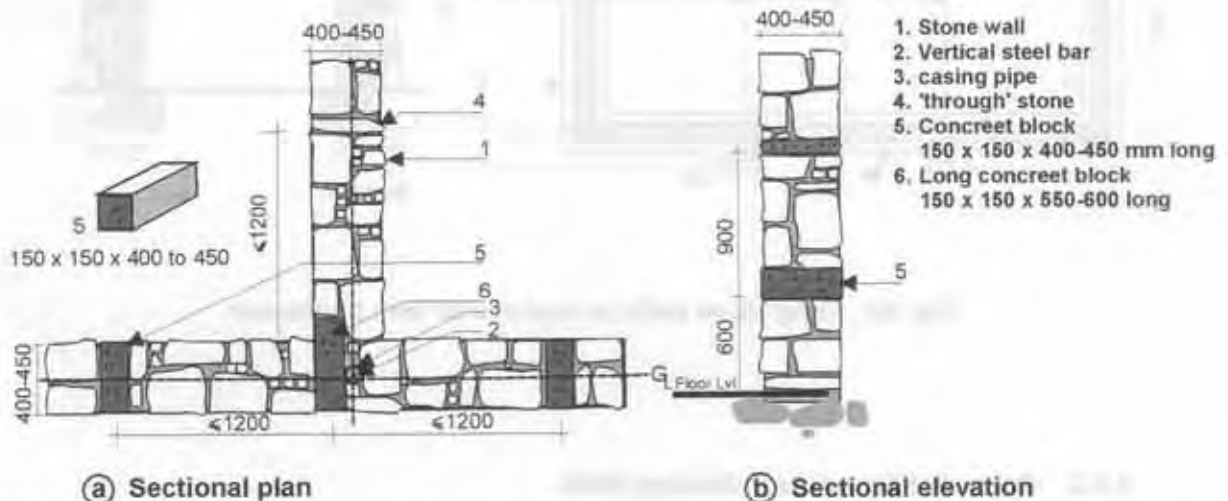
C 'Through' stone or bond elements in stone wall built in mud mortar
